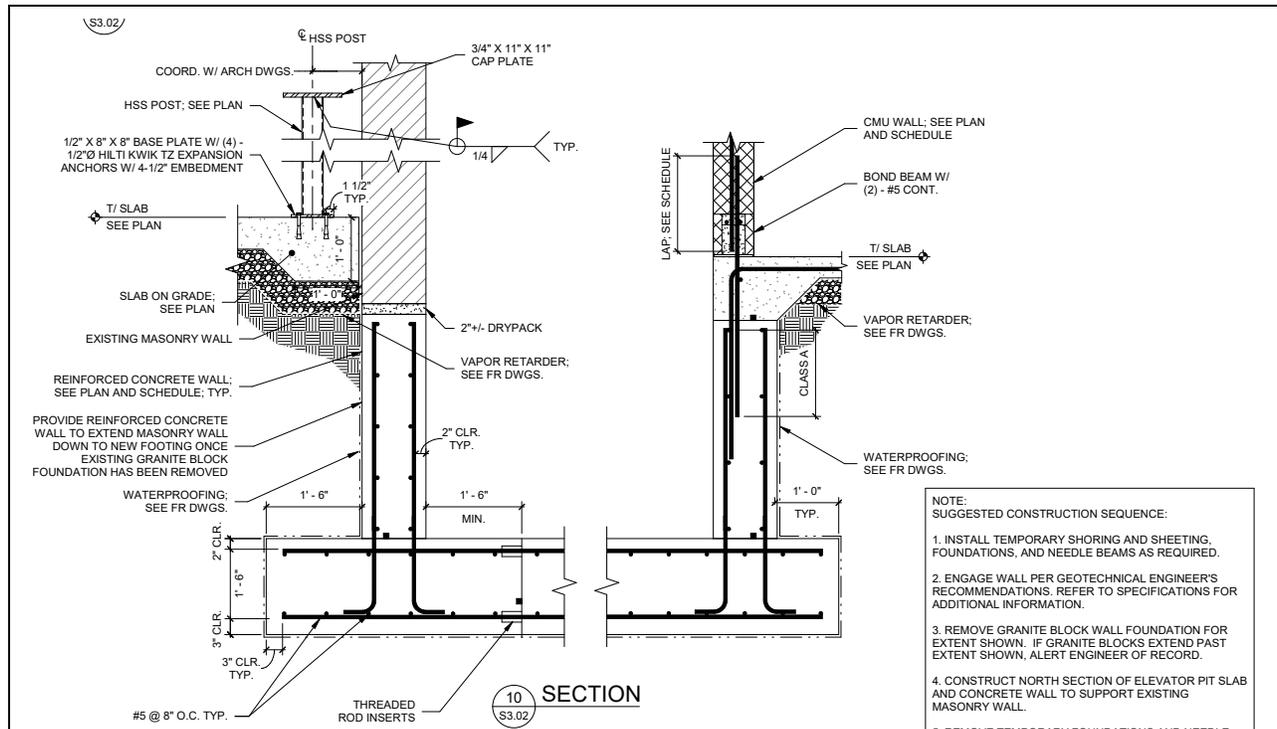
New work section through the existing masonry wall where the granite block foundations were removed. The foundation was poured in two sections to help act as shoring under the existing masonry wall, so that the needle beam shoring could be removed prior to finalizing the pit.
